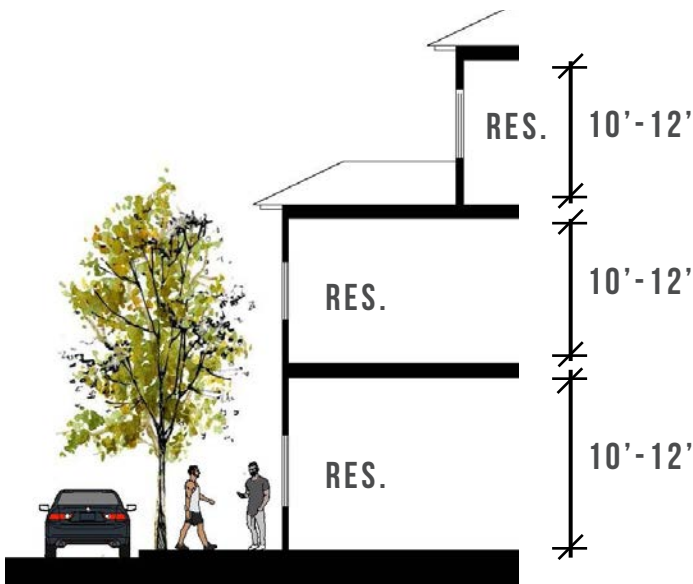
Example of standalone residential building that could occur on First Street or San Antonio Road Districts.
